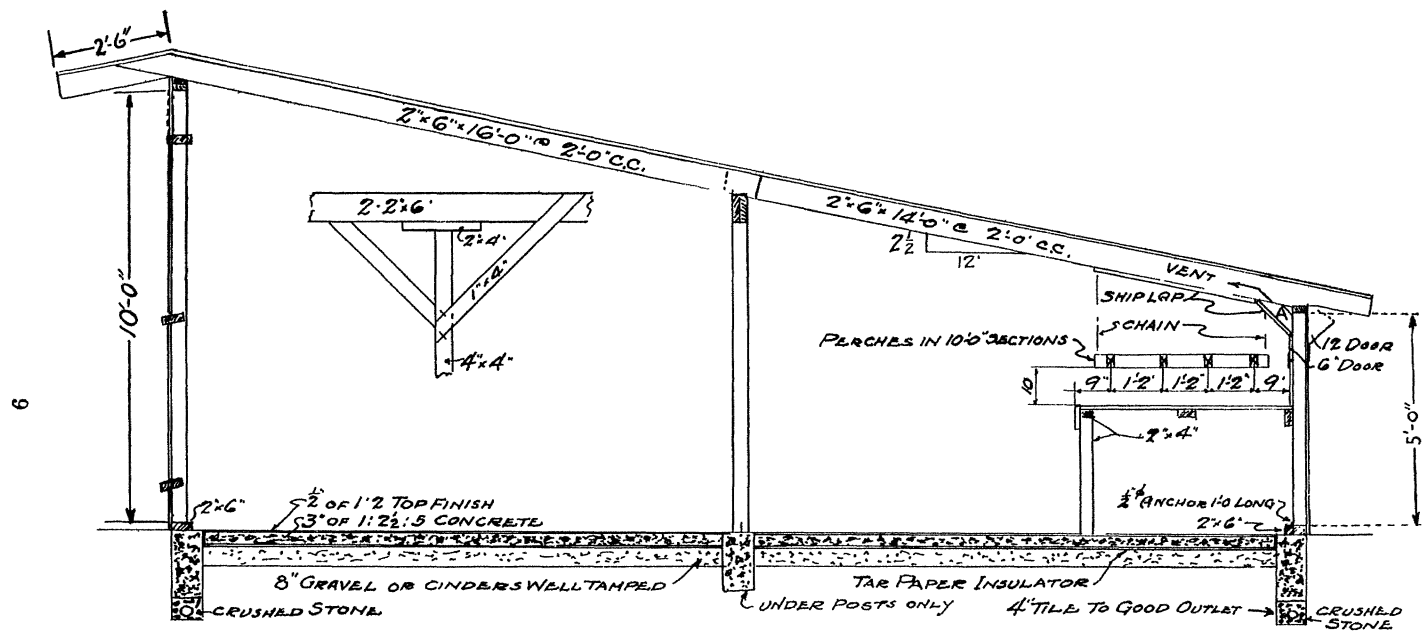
Cross section of poultry house. Height in front 10 feet, sloping to 5 feet in rear. The 4- by 4-inch in center indicates position of center posts. This detail is also shown in Fig. 18. Note arrangement of roosts, and the double wall over roosts and down as far as the dropping board in the rear. The roosts may be made of either 2- by 2-inch or 2- by 4-inch material, with rounded tops and swing from rafters by means of a chain. Insert shows the method of bracing from the center posts. The 2- by 4-inch shown strengthens the joint of the two 2- by 6-inch supports. There is a fall of $2\frac{1}{2}$ inches to the foot, in slope of roof. Detailed cross sections thru the front and rear are shown in Figs. 15 and 17.
